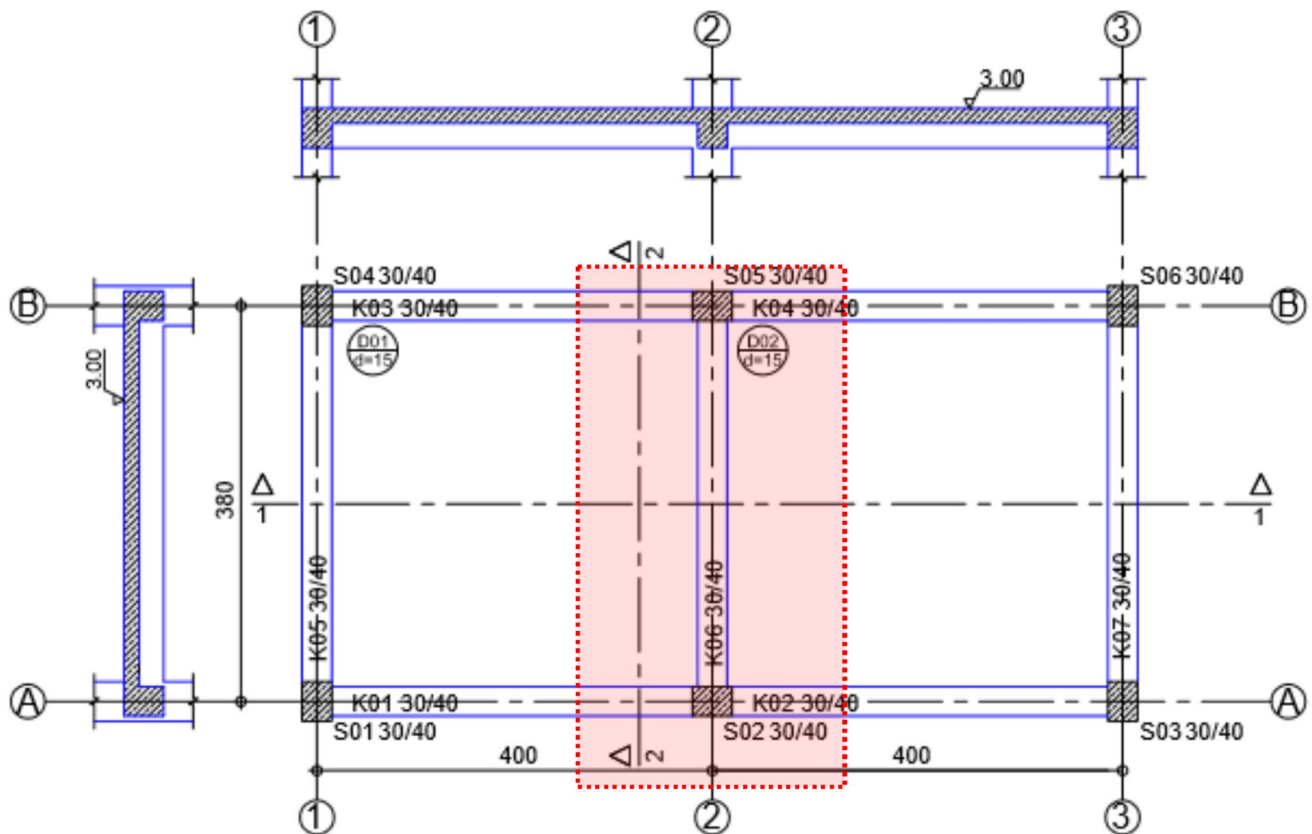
The plan view of the prototype and extracted frame structure (dimensions in cm)
